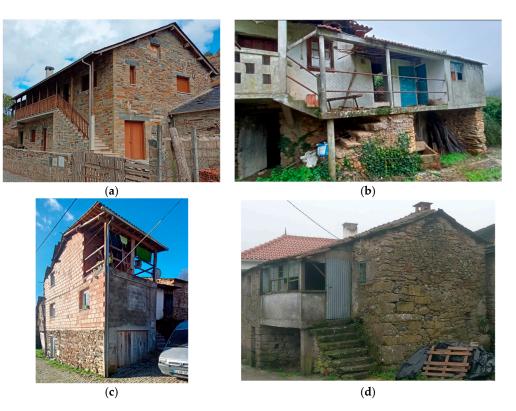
Some of the observed newly built and modern interventions in MNP. (a) Newly built concrete building with a stone facade that resembles BS typology. (b) Modified balcony with concrete materials. (c) Three-storey building with brick walls. (d) Example of Modified Protruding Staircase (MPS) typology.
